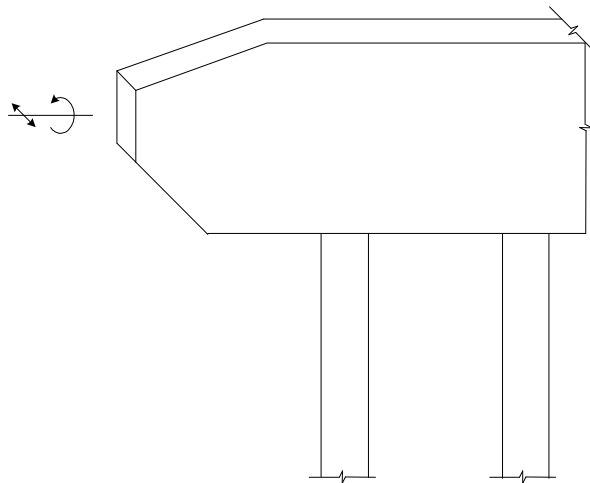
Simple diagram of an FIAB with a cantilevered in-line wingwall
